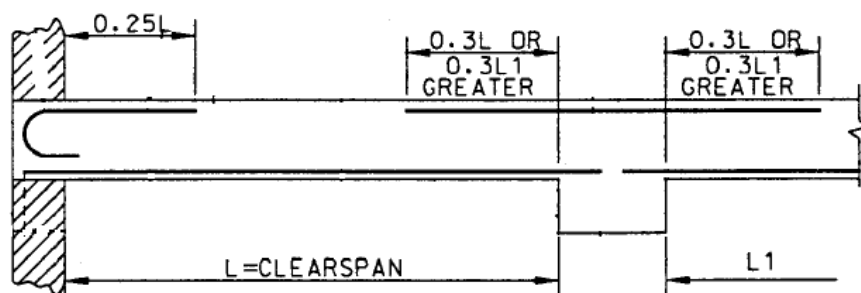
Typical rebar details for slabs as per ACI 315-99 [5]
